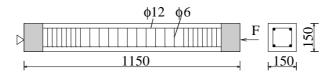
Geometry of specimens in mm (drawn in horizontal position).
